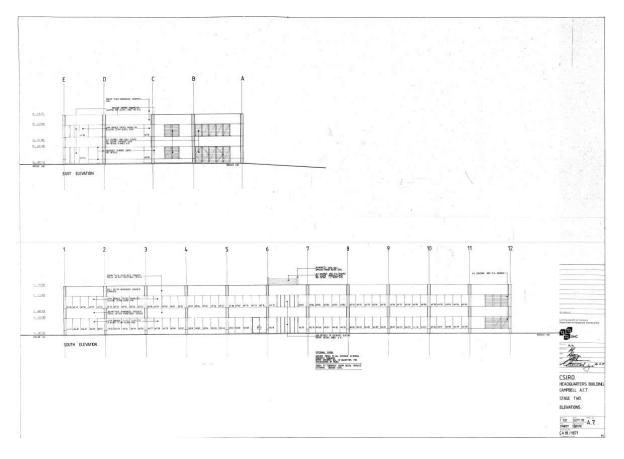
Original architectural drawings of Building 3, elevations, 1981. (Source: DOMA Group)
